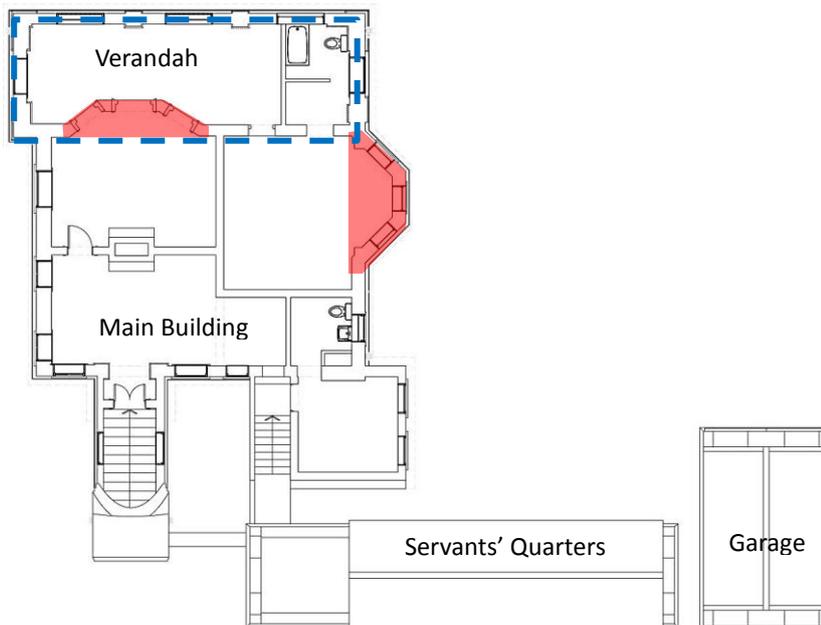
Existing layout plan of SSQ. (Source: Prepared by Betty Tay)
